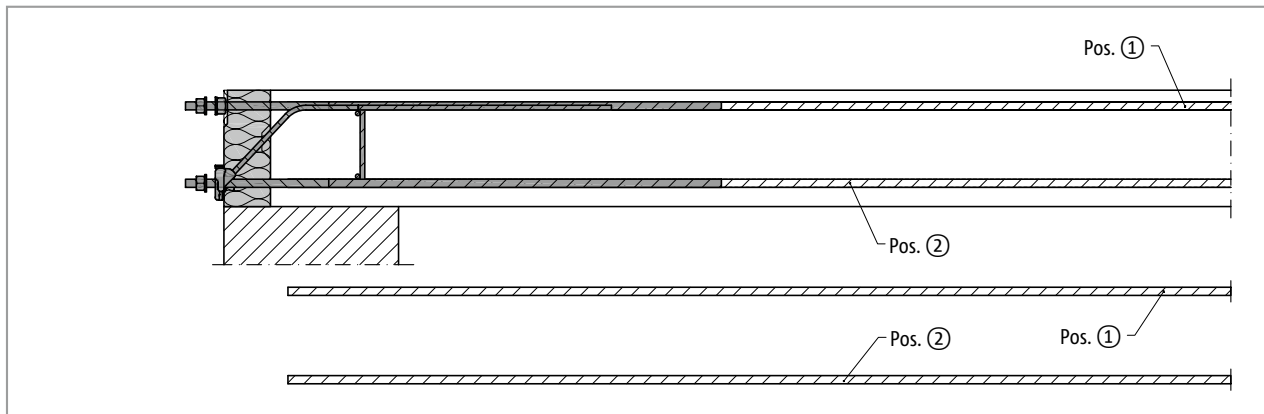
Schöck Isokorb® T type SK-MM1-VV1: On-site reinforcement: Cross section
